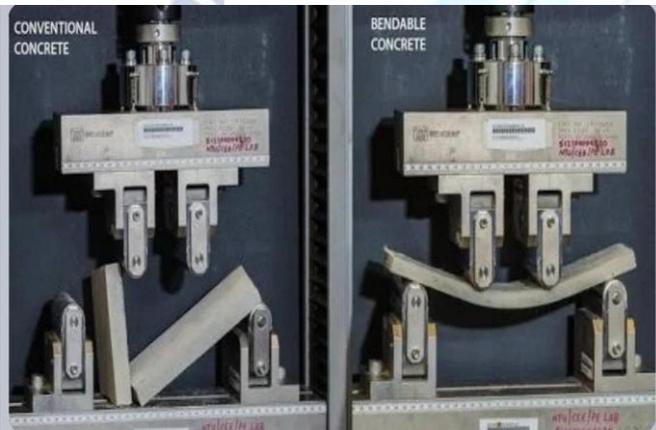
Conventional Concrete(left) vs Bendable Concrete(Right) after a bend test
